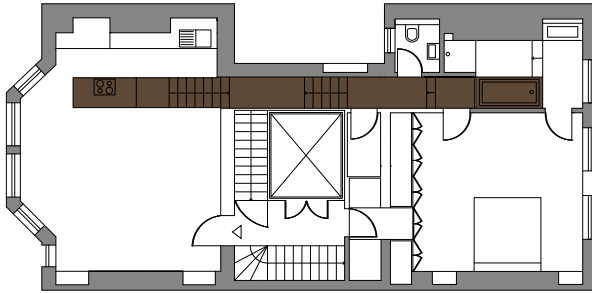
No 1 Balfour Place, plan drawing of the stair transforming into the defining “essential” element, London. (KHBT Architects; drawing/image courtesy of KHBT Architects).
